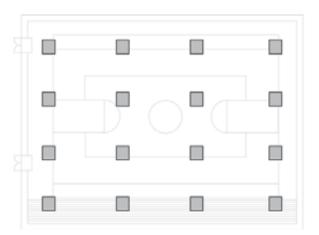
Typical 7600 ft² gymnasium floor plan with skylights.
